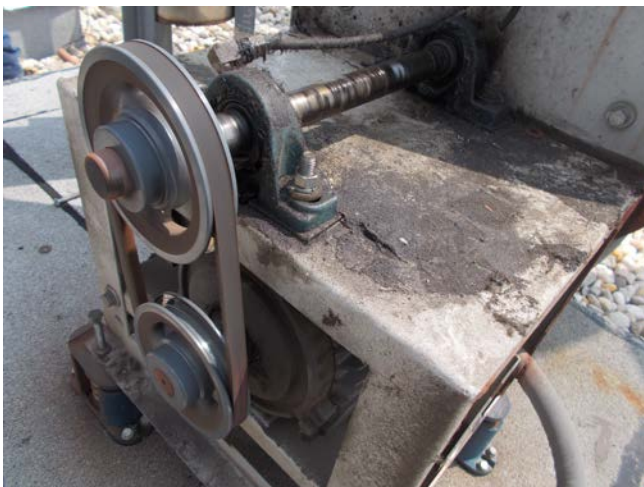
View of typical SSDS fan belt and assembly (EF-4).
